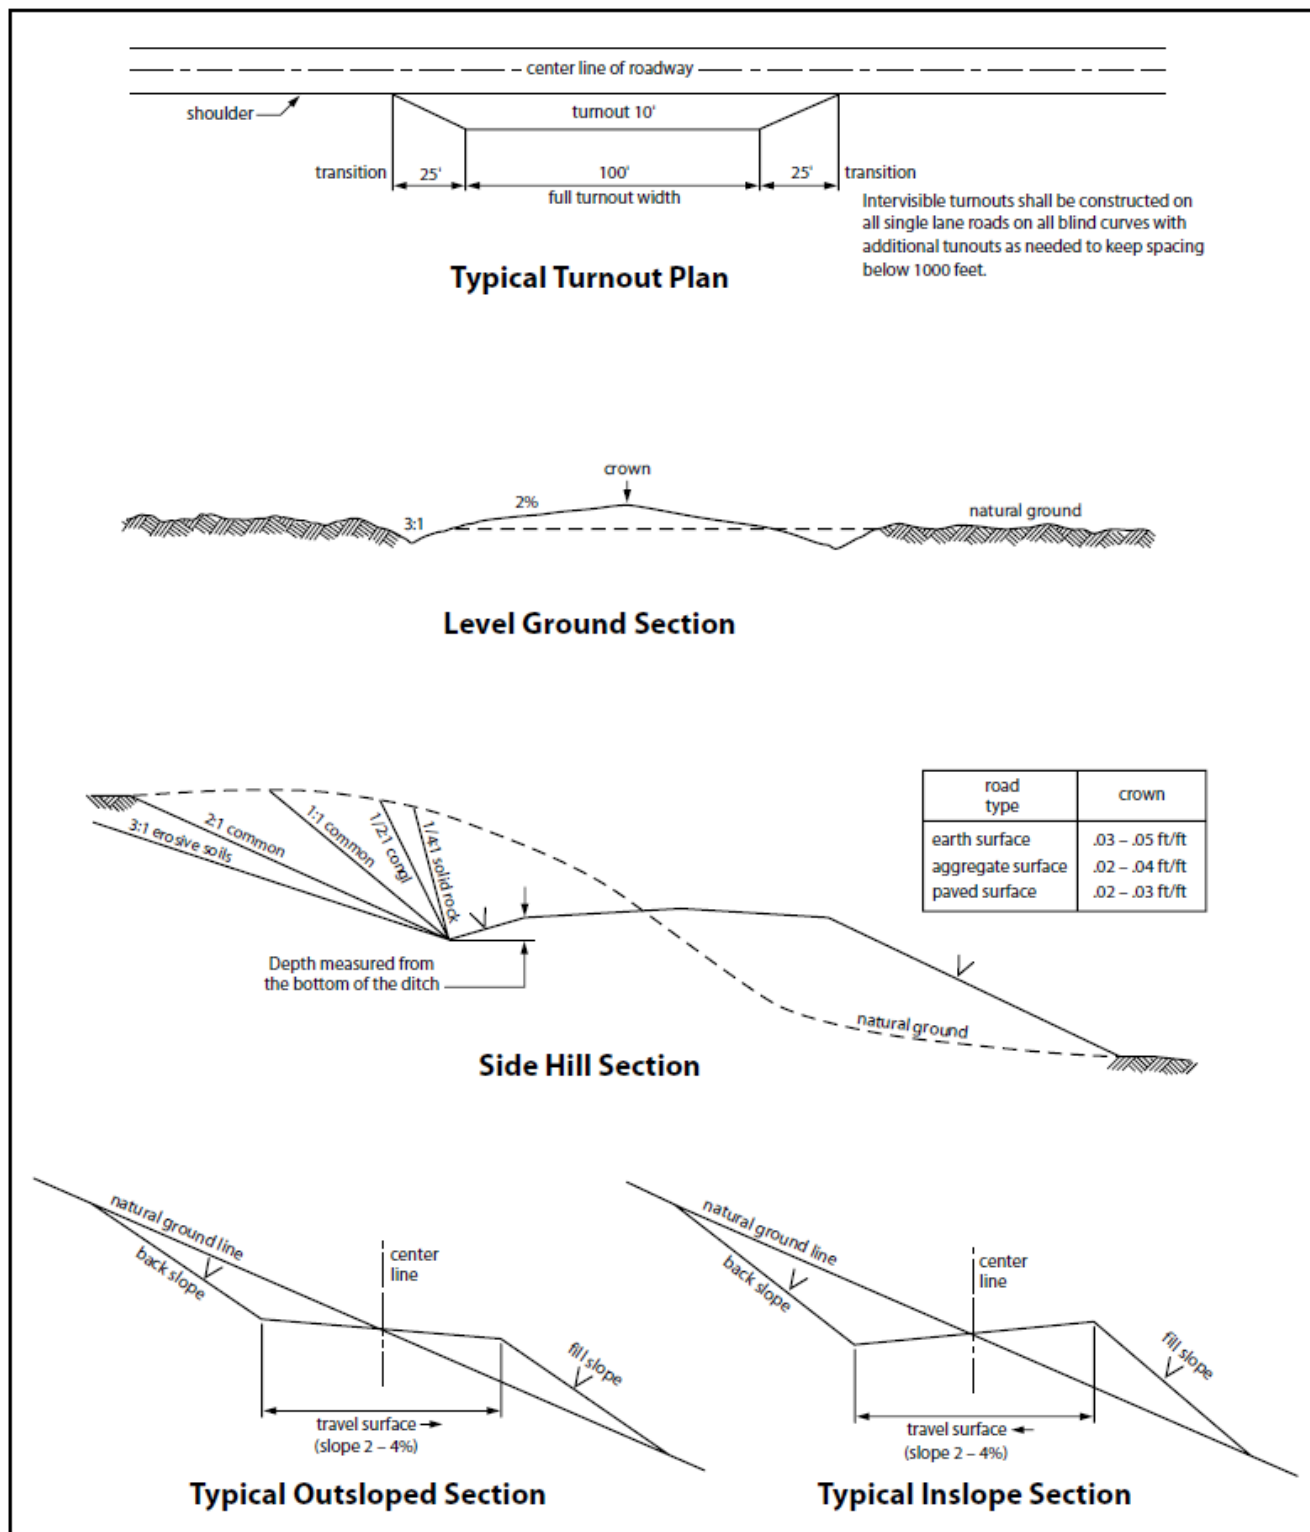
Cross-sections and plans for typical road sections representative of BLM resource or FS local and higher-class roads.
